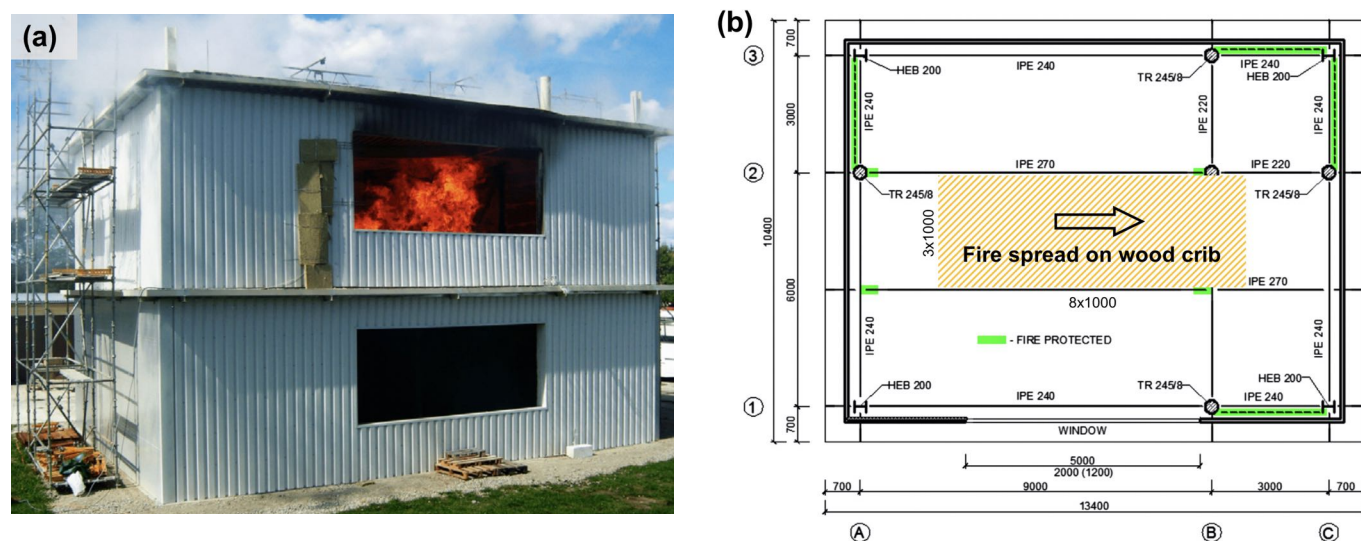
(a). Photo of the fire progression during the Veselí Travelling Fire Test on the upper floor; and (b). Plan view of upper floor structural layout and wood crib distribution (unit in mm). (both figures adapted from Cábová *et al.* [13])
